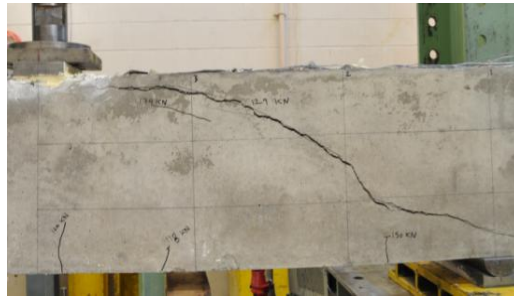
Failure mode of beam without web reinforcement (0-0-UR)
